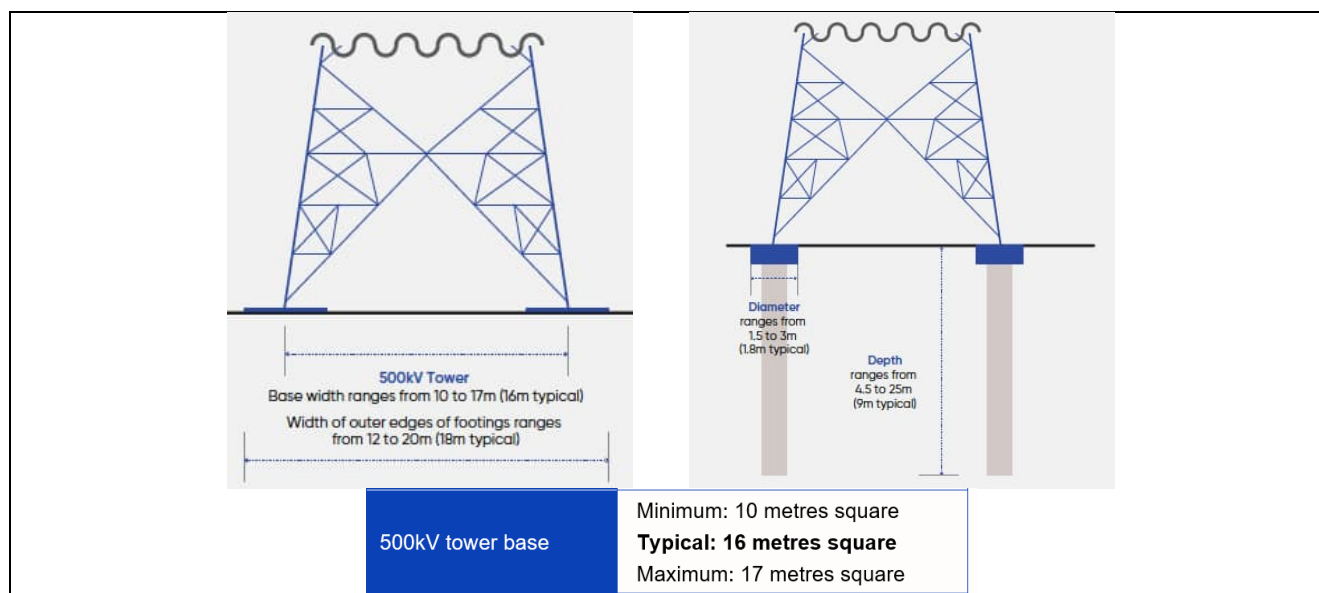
Proposed transmission line tower base dimensions and tower footings (Source: AusNet, 2025)
